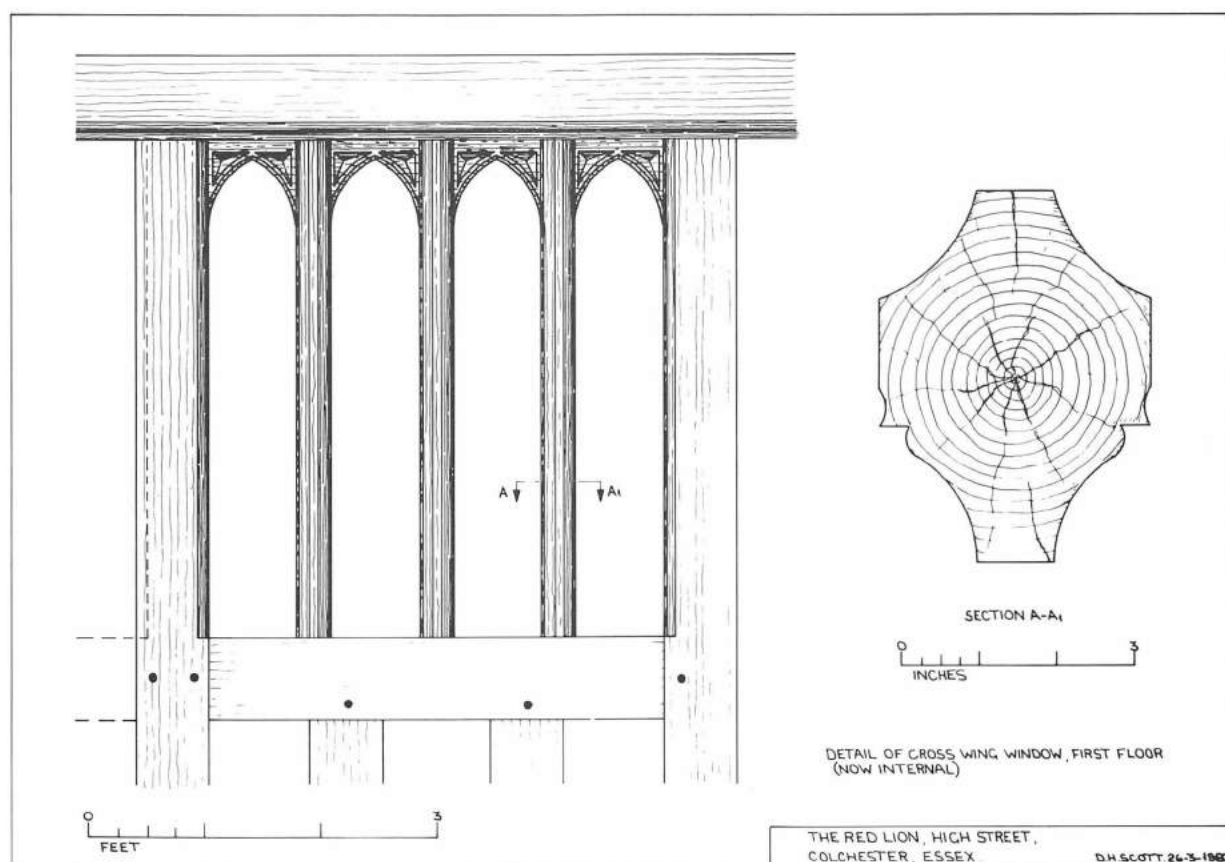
The Red Lion, Colchester. Detail of cross-wing window (now internal), first floor.
